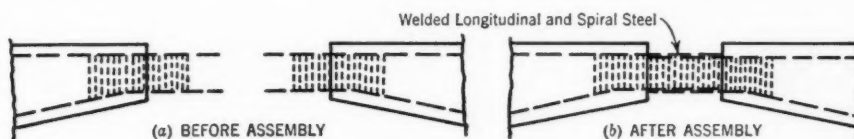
ASSEMBLY OF THE CONSIDÈRE HINGE
